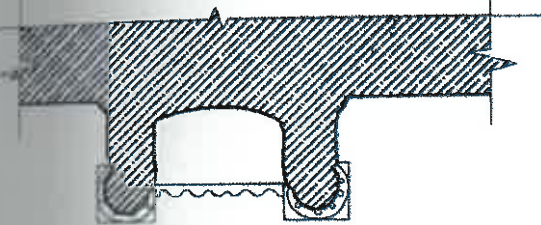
DETAILED ENTRANCE DOOR OF FADI KA BANGLA
